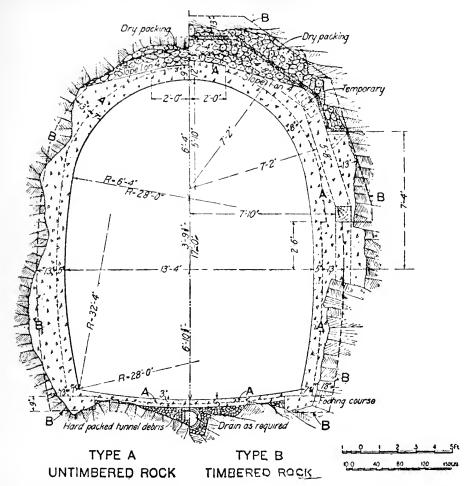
Types of Construction of Tunnel at Hydraulic Grade.
